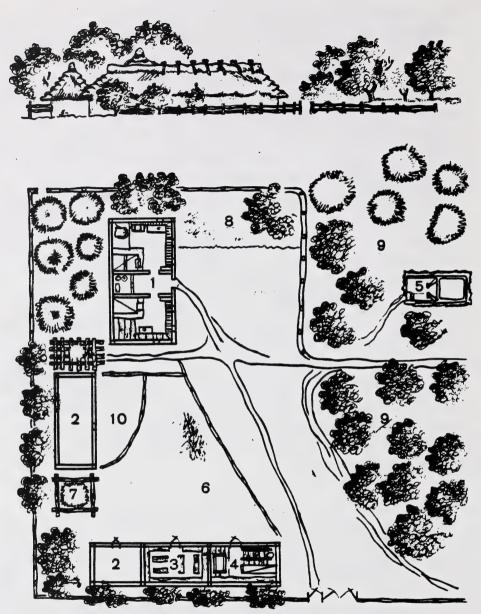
Potter's yard plan with free arrangement buildings in southwest Ukraine, circa 1900. 1-house; 2-machine shed; 3-storage area; 4-forge; 5-oven; 6-firewood storage; 7-clay storage; 8-flower patch; 9-garden; 10-corral. (In T.V. Kosmina. Silske zhytlo Podillia. Kiev: Naukova Dumka, 1980), p. 76.
